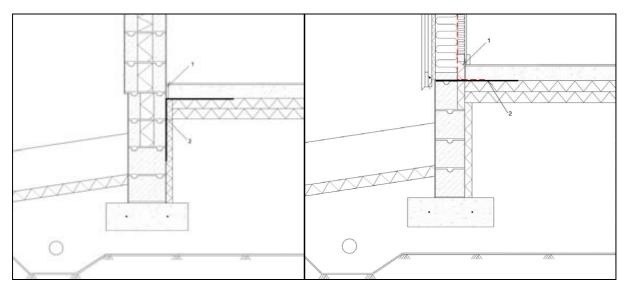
Examples of airtight junctions between a slab-on-ground structure and external wall.
